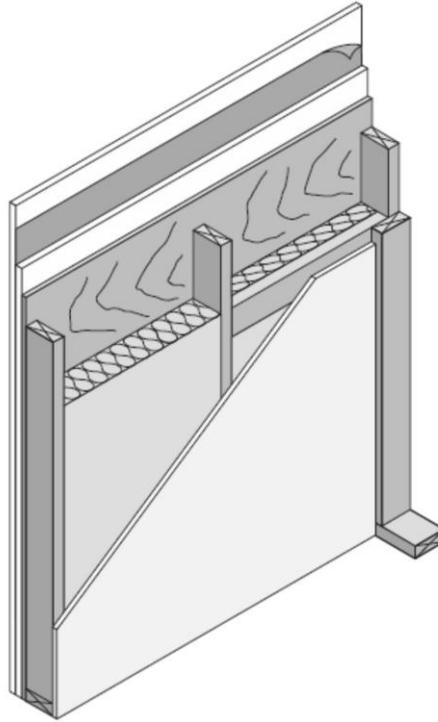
x.x - Wood Framed Wall 2x4 24" o.c. AWF
